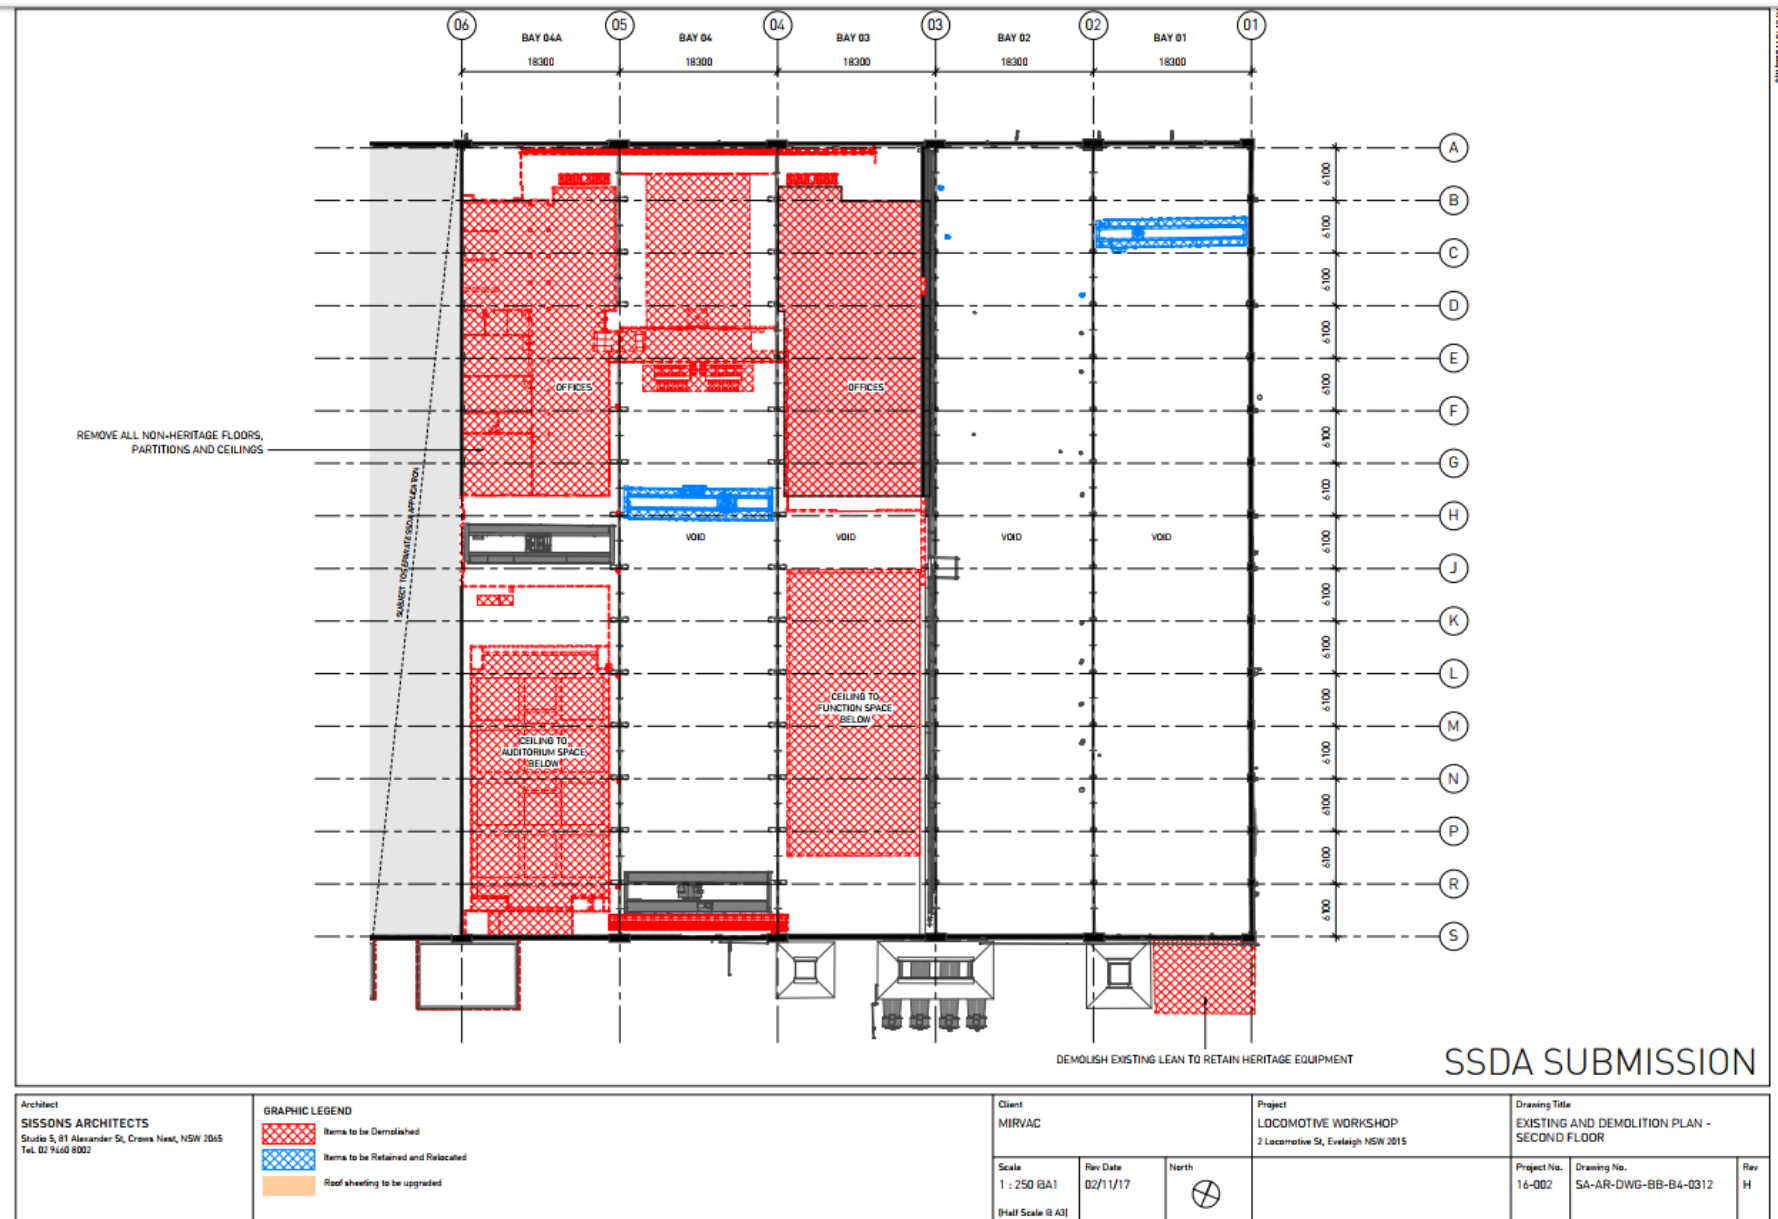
EXISTING AND DEMOLITION PLAN—SECOND FLOOR (SOURCE: SISSONS, DRAWING SA-AR-DWG-BB-B4-0312, REVISION H, 2.11.17)
